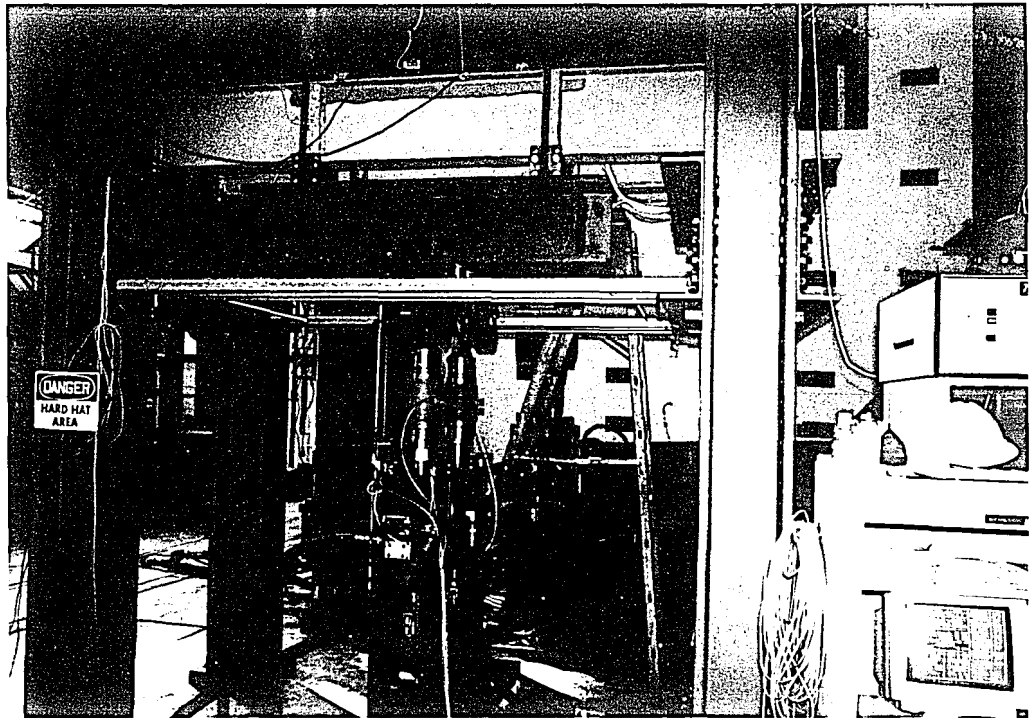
ATLSS Laboratory Test Setup Utilizing TSS Jacks With Typical I-beam Fatigue Test Setup That Allows for Reverse Loading.
